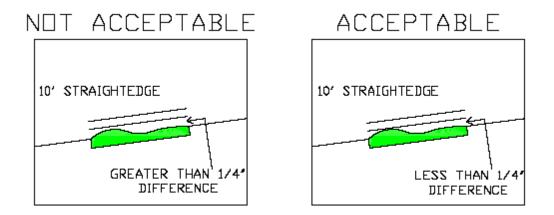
Example 8: Surface tolerances for street repairs should meet the standard for new construction.
